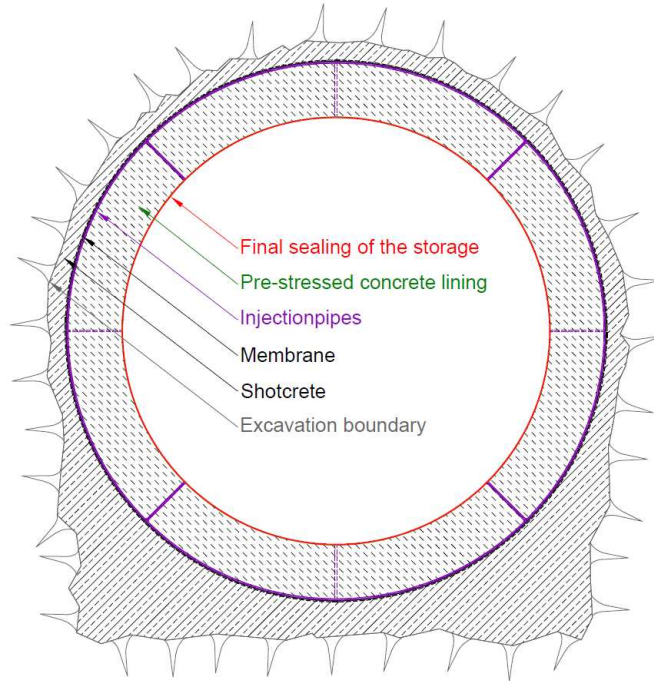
Cross-section of the pre-stressed concrete lining for the hydrogen storage at ZaB
